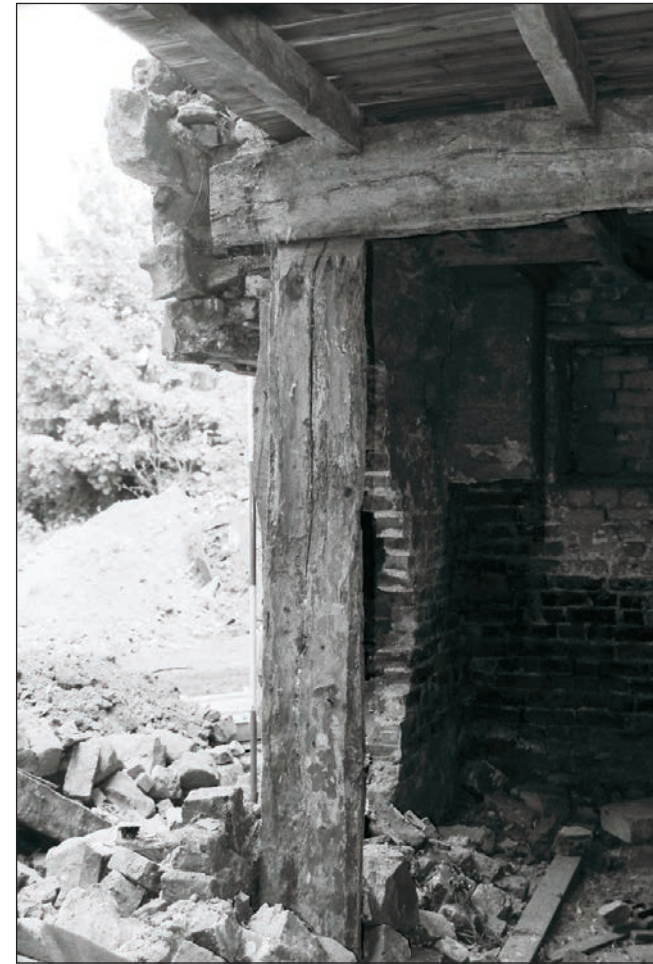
Detail of timber supports, G3, Building 1 (Film 03.34)
